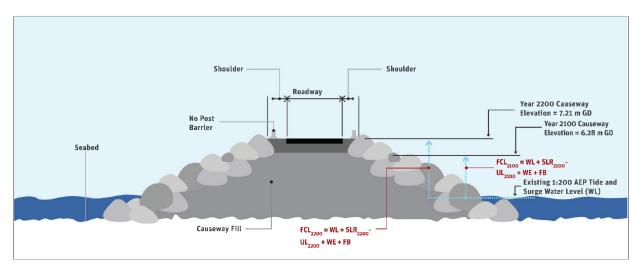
Causeway cross-section showing year 2100 and 2200 elevations
